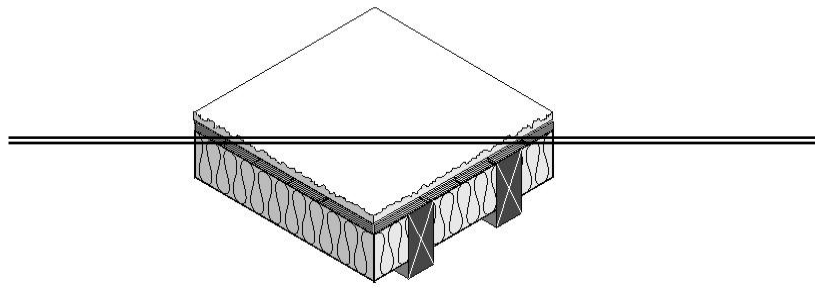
Wood Framed Floor without a Crawl Space
